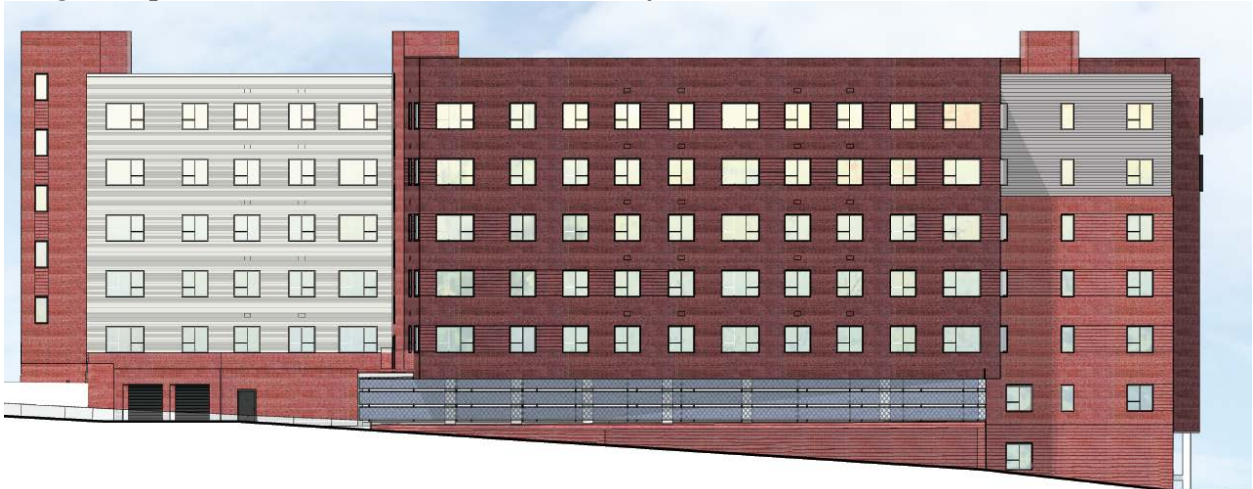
Option 3, Southeast Elevation (As seen from New Private Access Road).
